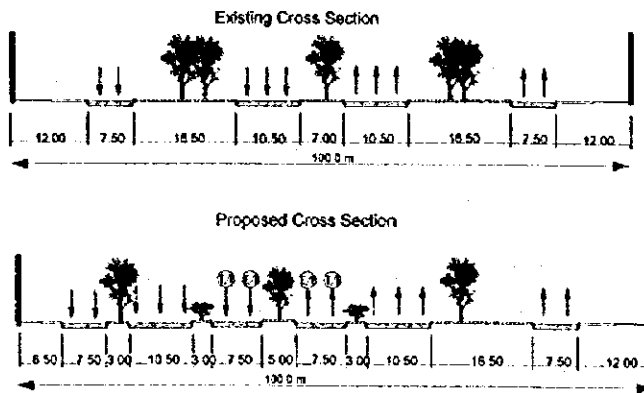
Typical Cross Section on Autopista Norte (2)
